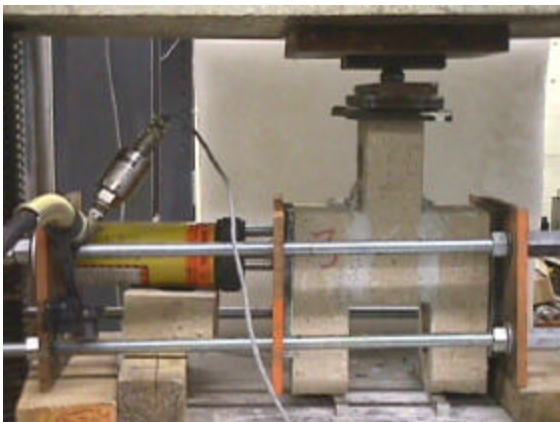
Equipment designed to apply compressive and shear stress on the tested joints.
